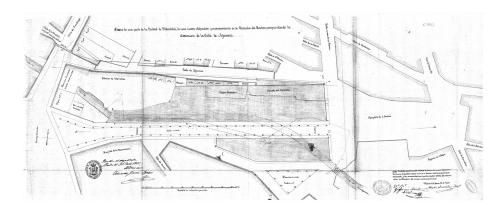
Plan of the new design of the channelling and alignment reorganization (Valladolid Municipal Archive)
